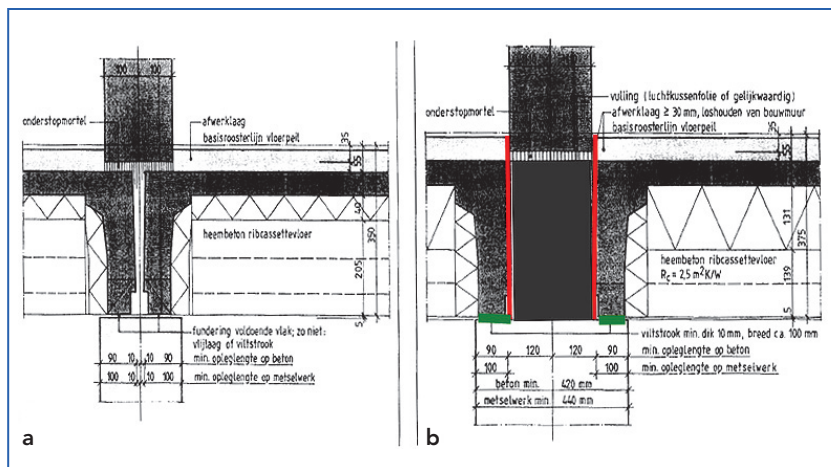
The junction between the solid separating wall, ground floor, foundation: a. The rigid junction before 1994 (the ground floor is placed between the separating wall and the foundation; b. The flexible junction after 1994 with ground floor next to the solid wall separated by 15 mm EPS (red lines) and a flexible layer of 10 mm rubber or fur felt (green lines) and a 200 mm broader foundation, See Hartman et.al. 1998].
